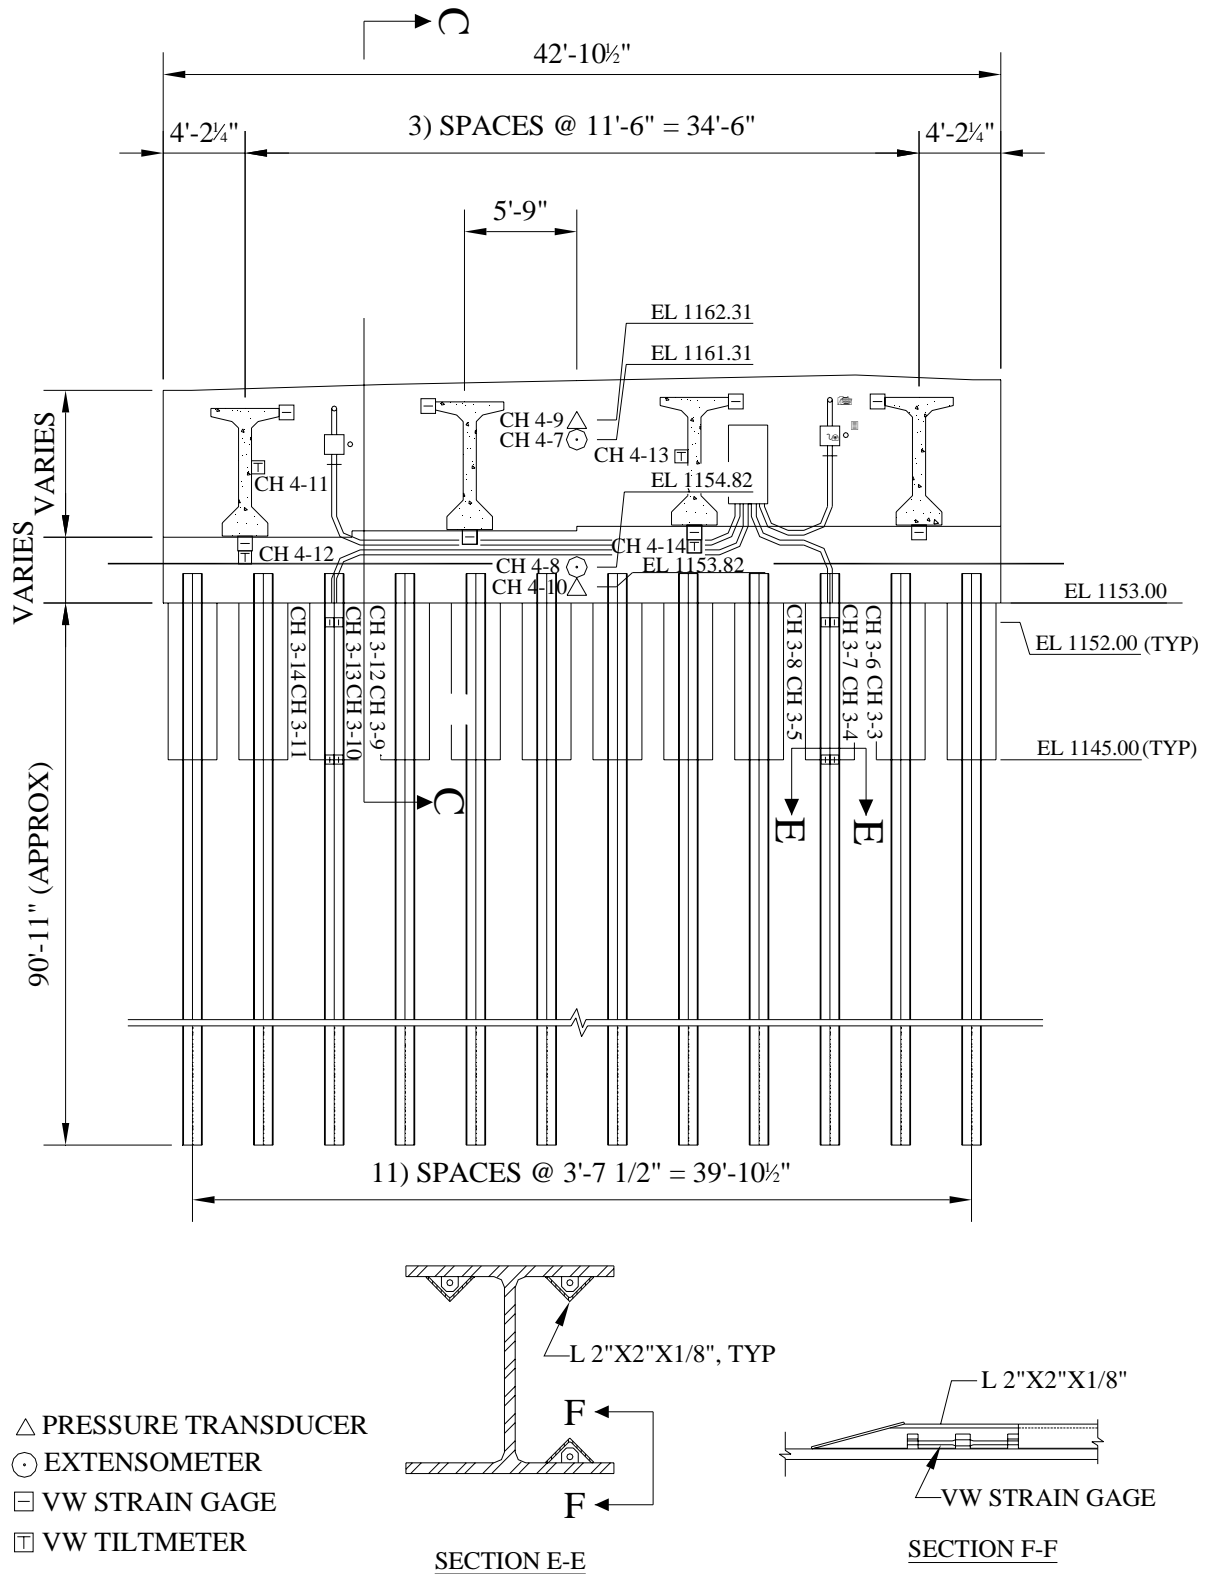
Structure 109 Abutment 1 Elevation (Section D-D).
